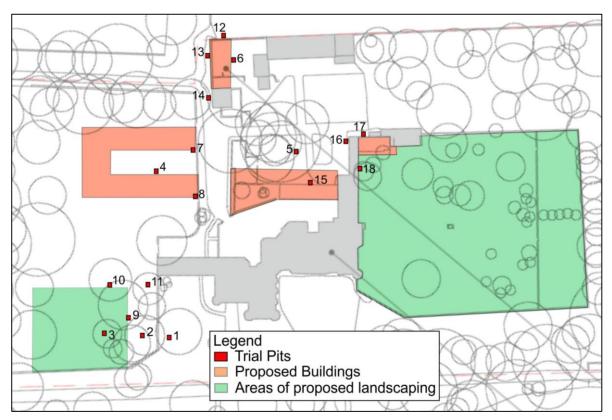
Location of Trial Pits excavated with Trench numbers as assigned by ARCHAS
